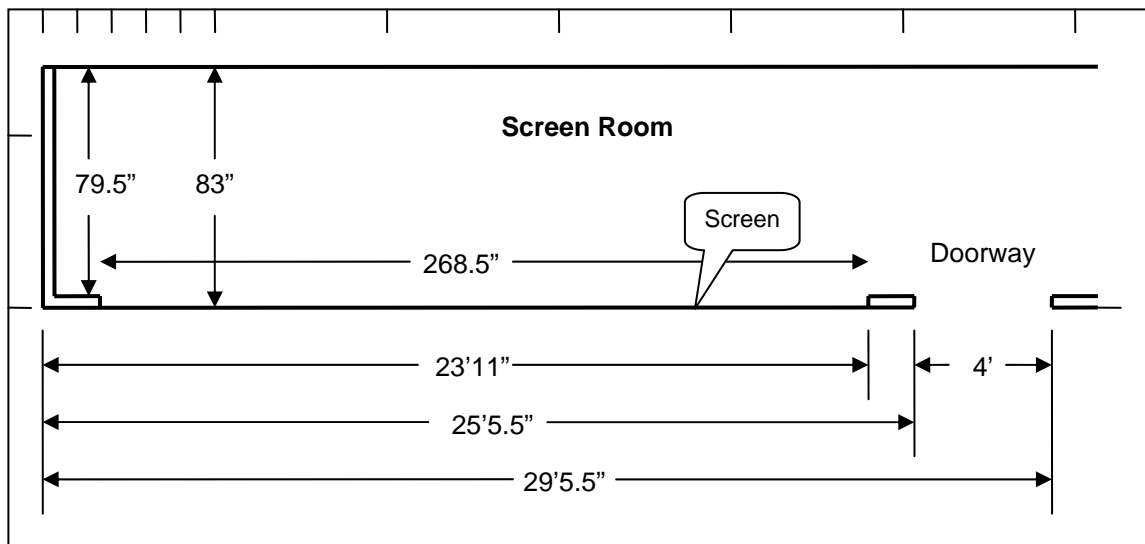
Video Wall Room immediately behind the video wall (Plan view)
